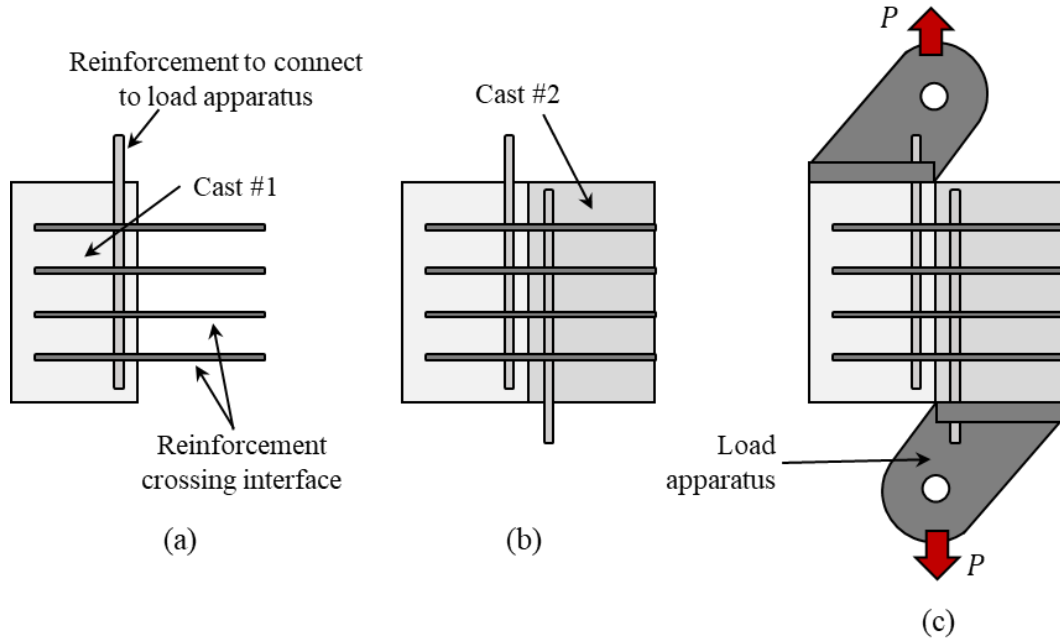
Typical casting and testing procedure for pull-off tests: (a) casting of first component, (b) casting of section component, and (c) attaching load apparatus and testing of pull-off specimen.
